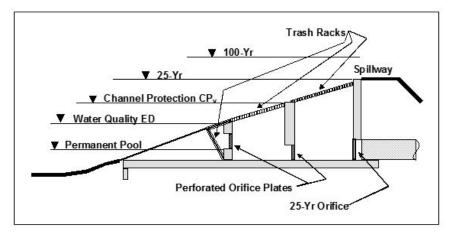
Schematic of Orifice Plate Outlet Structure
